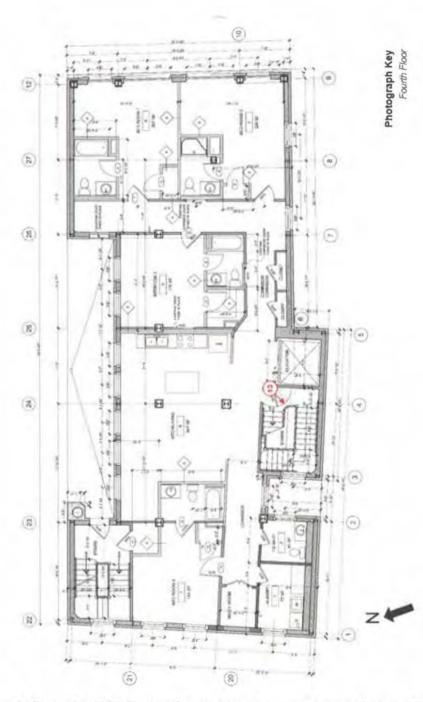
Fourth-floor plan (2016), showing interior photo numbers and views. Reproduced by permission from the current owner, Wallachia LLC.
